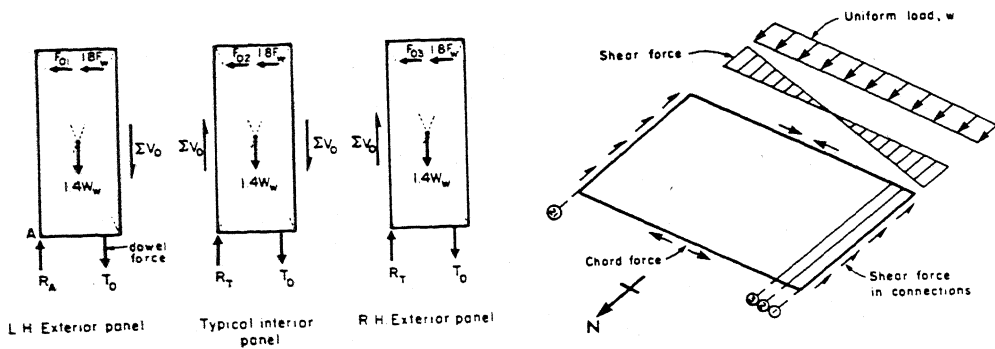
Resistance of East & West Wall panels to lateral loads. Figure 6: Forces assumed to act on Roof diaphragm.
